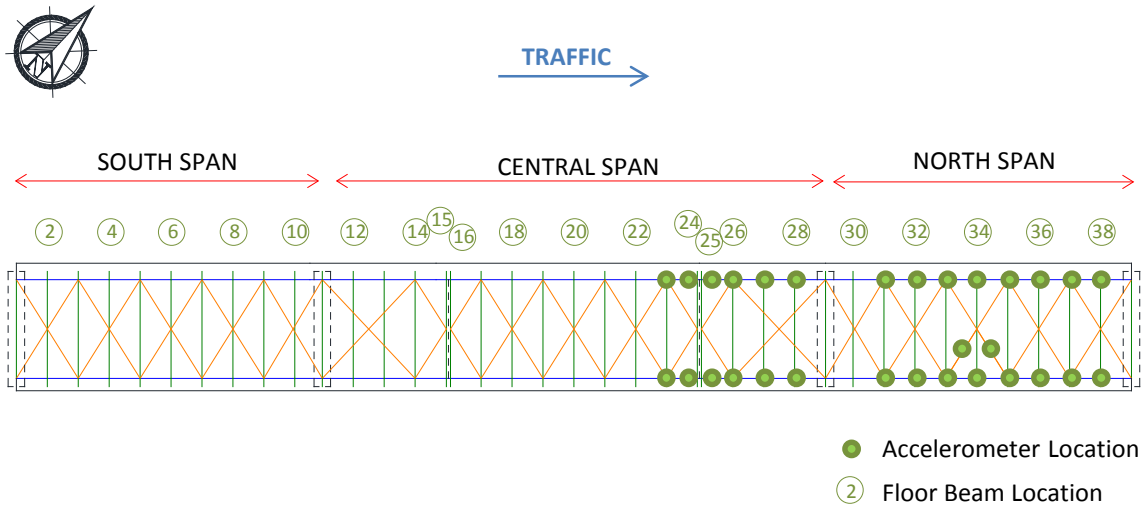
Plan view of the Medina River Bridge showing accelerometer locations.
